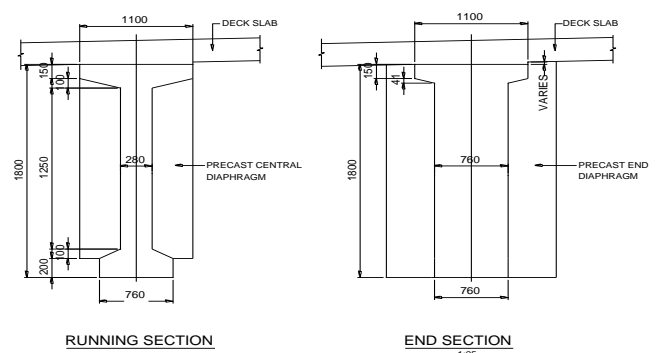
Cross sectional details of I girder for Five Girder Arrangement
